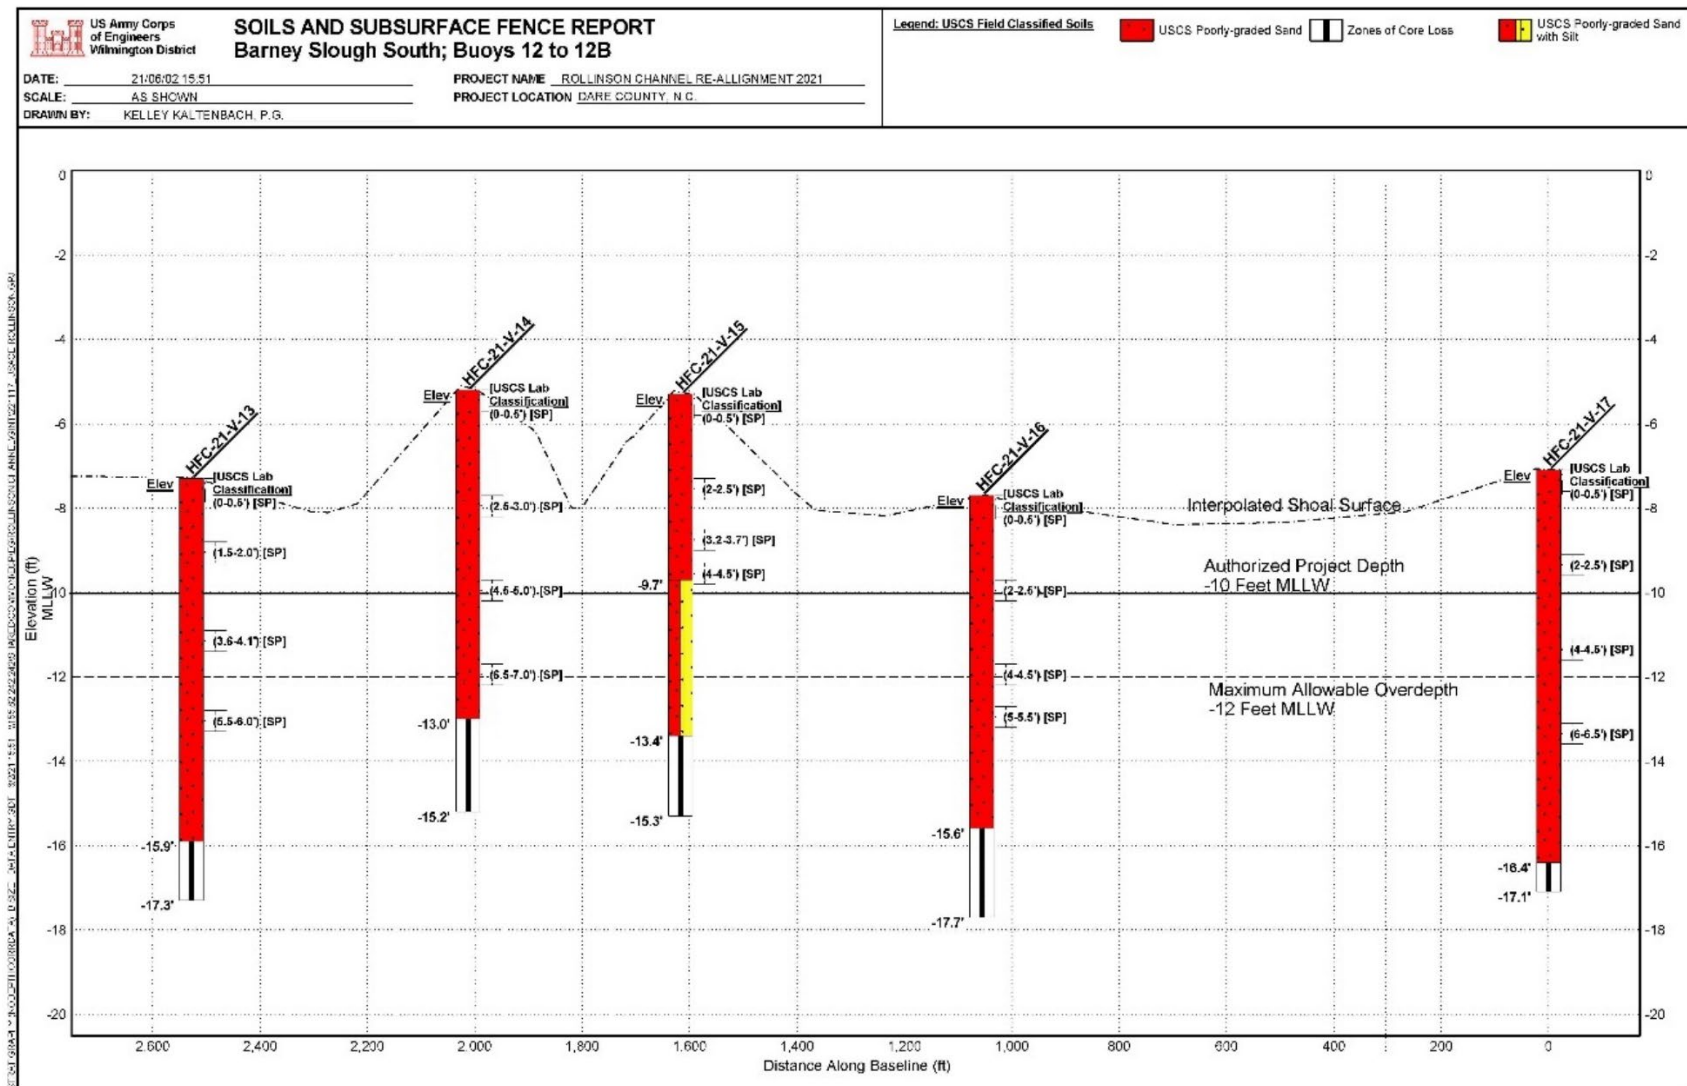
Fence cross-section, borings in Barney Slough Channel South.
